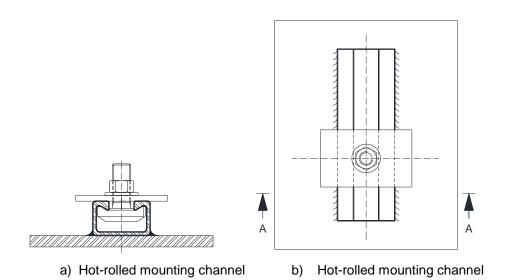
Example of a hot-rolled mounting channels with corresponding channel bolt
